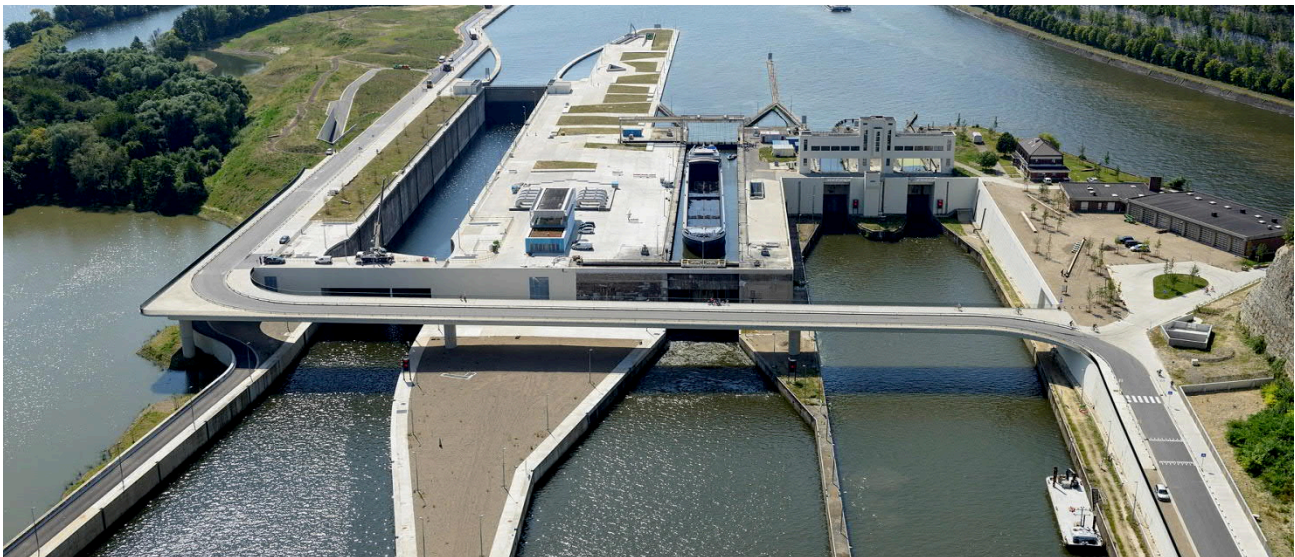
Downstream view – new bridge – © JL DERU/photo-daylight
